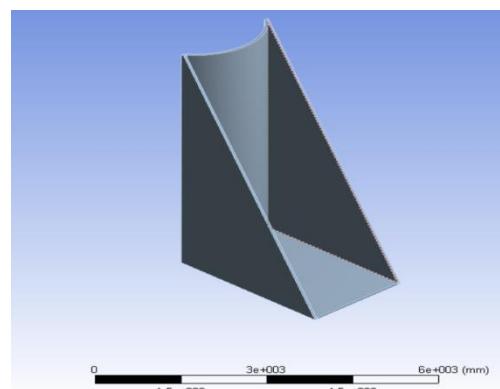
Ferrocement Arch Stem and Flat Base Retaining Wall of 50 mm Thick
